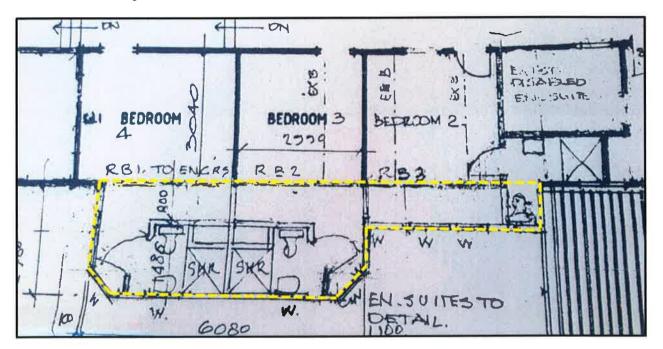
Yalara floor plan (proposed addition highlighted in yellow) (Source: Applicant's documentation)
